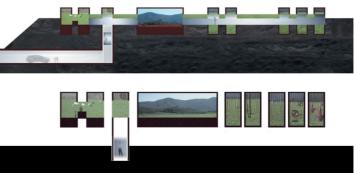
Conceptual sections , Horizon house, RCR architects (2007) • Source: El Croquis
